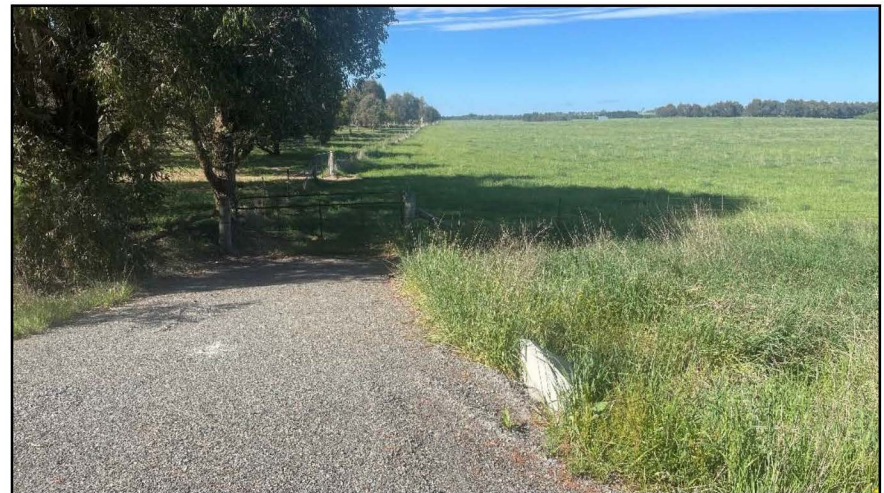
Existing entry and gate to Lot 2 building envelope (BE) (McGregor, 2024)
